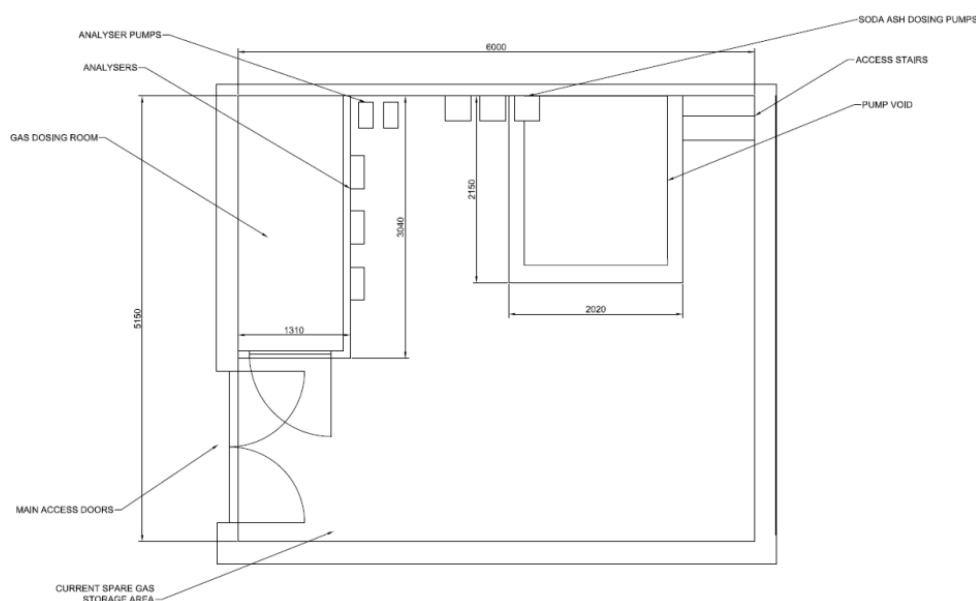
Quilpie Swimming Pool Complex existing plant room layout and storage area
